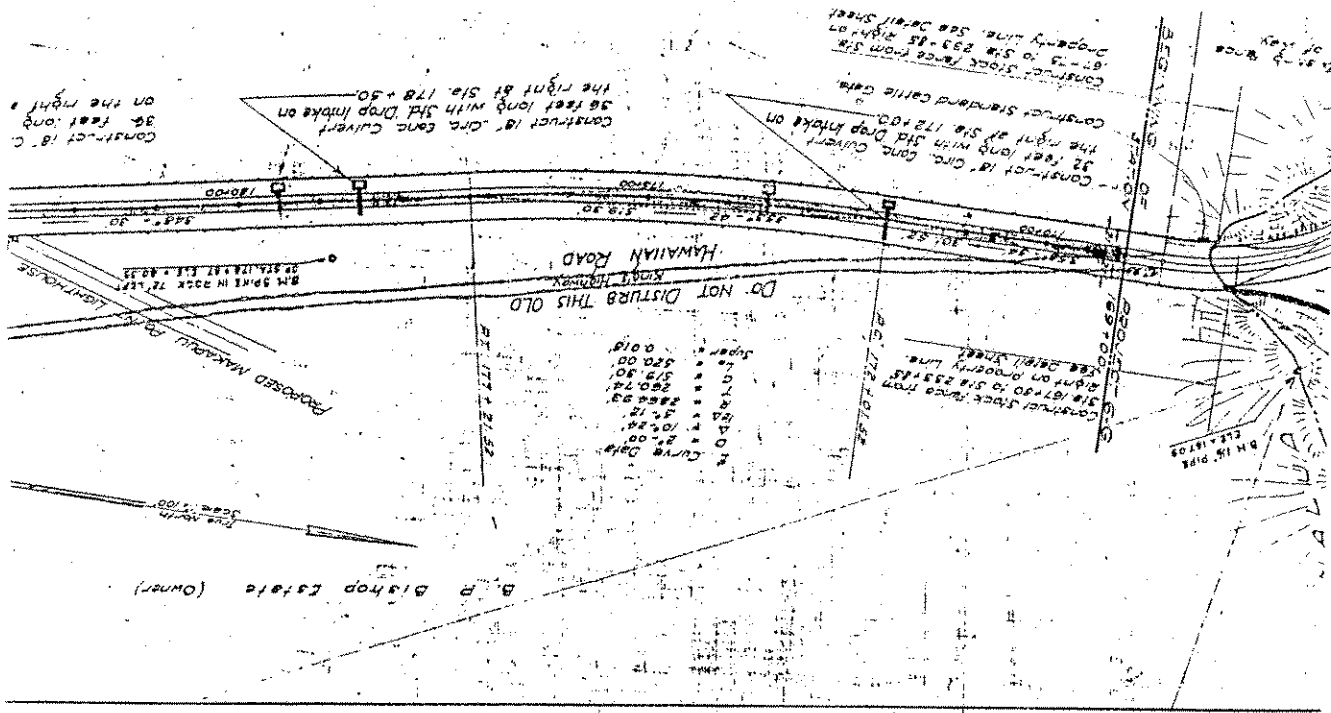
Portion of the plan for extending Kalamiana'ole Highway up Kealakipapa Valley to Makapu'u Lookout. The Hawaiian road is McAllister's site No. 3, Highway Plan 2/20/31, Note Book 522.
